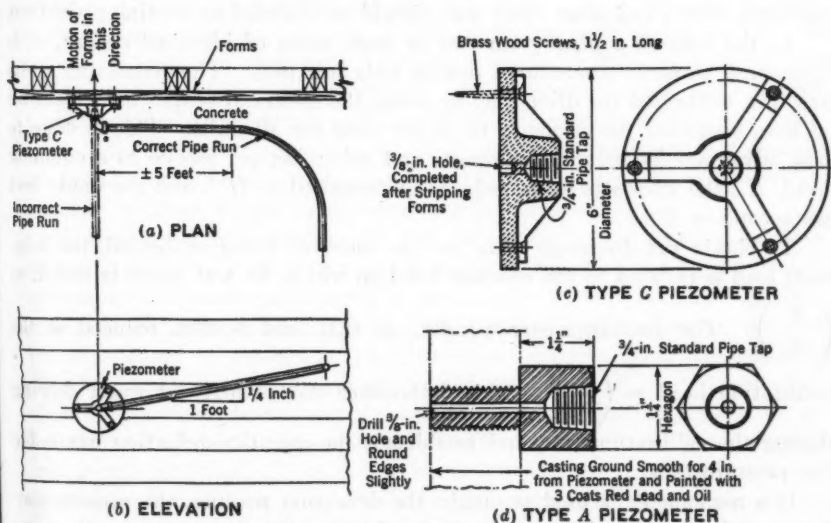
STANDARD PIEZOMETERS AND THEIR INSTALLATION
